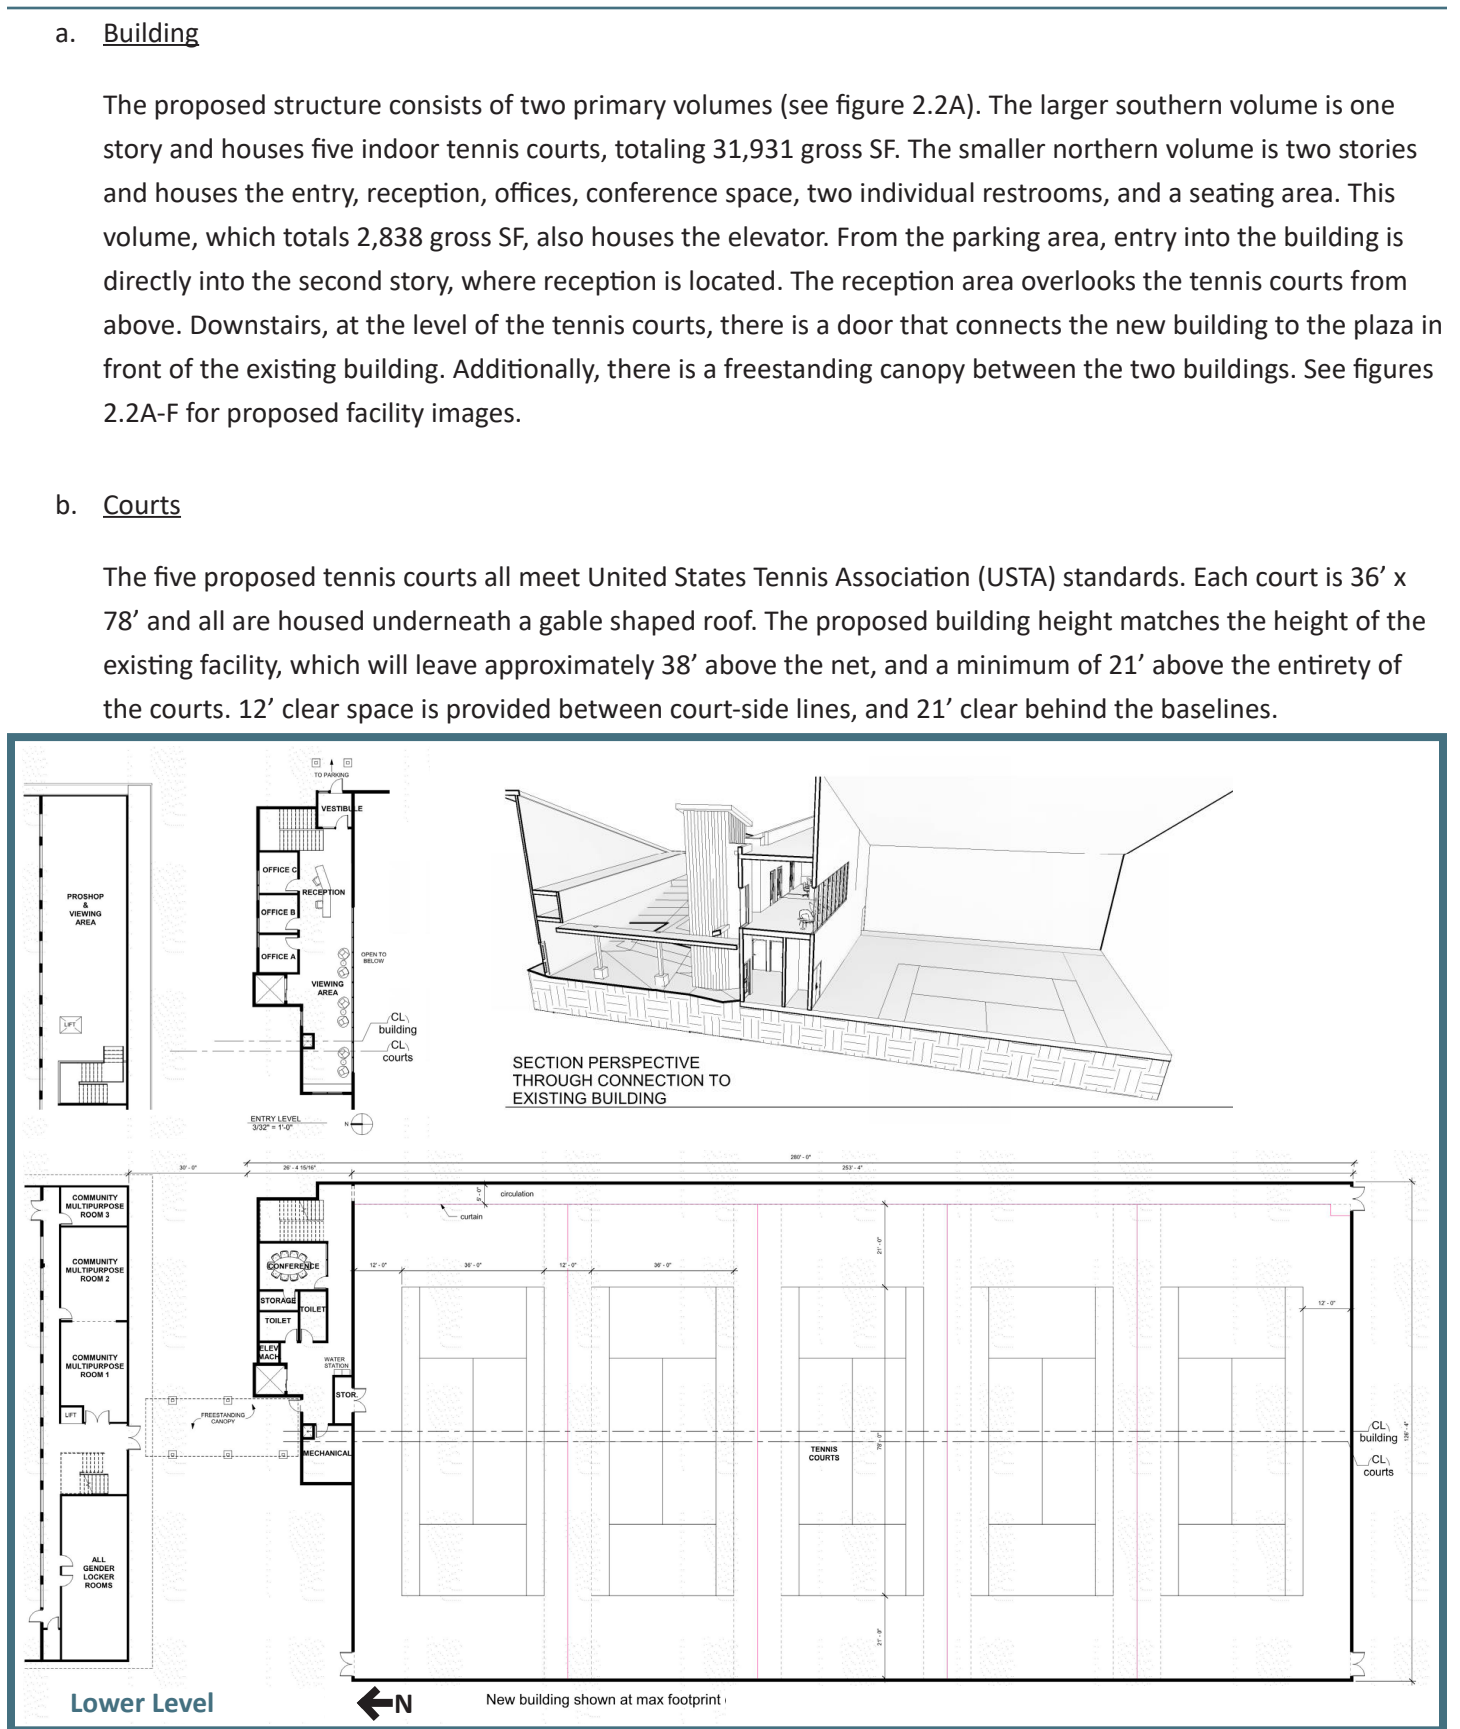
A Proposed new building layout. See appendix E for larger drawings.
